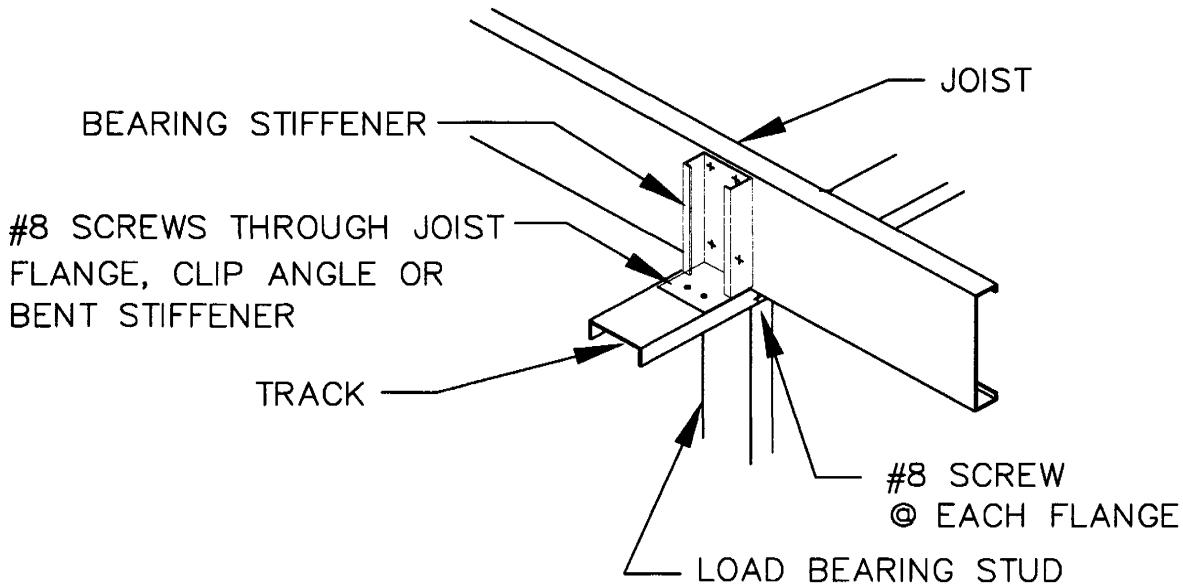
Continuous Span Joist Supported on an Interior Load Bearing Wall
